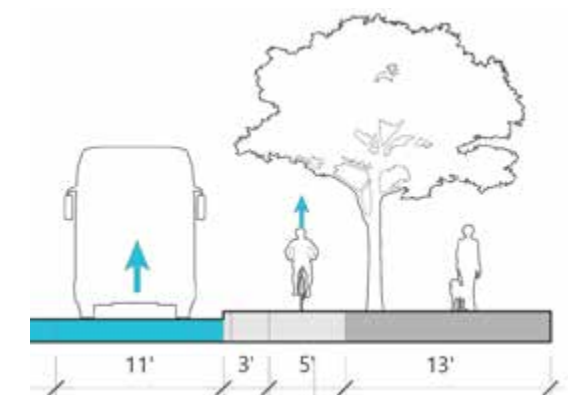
Bus on a Typical Downtown Collector Street with a One-Way, Sidewalk-Level Class IV Bikeway.
